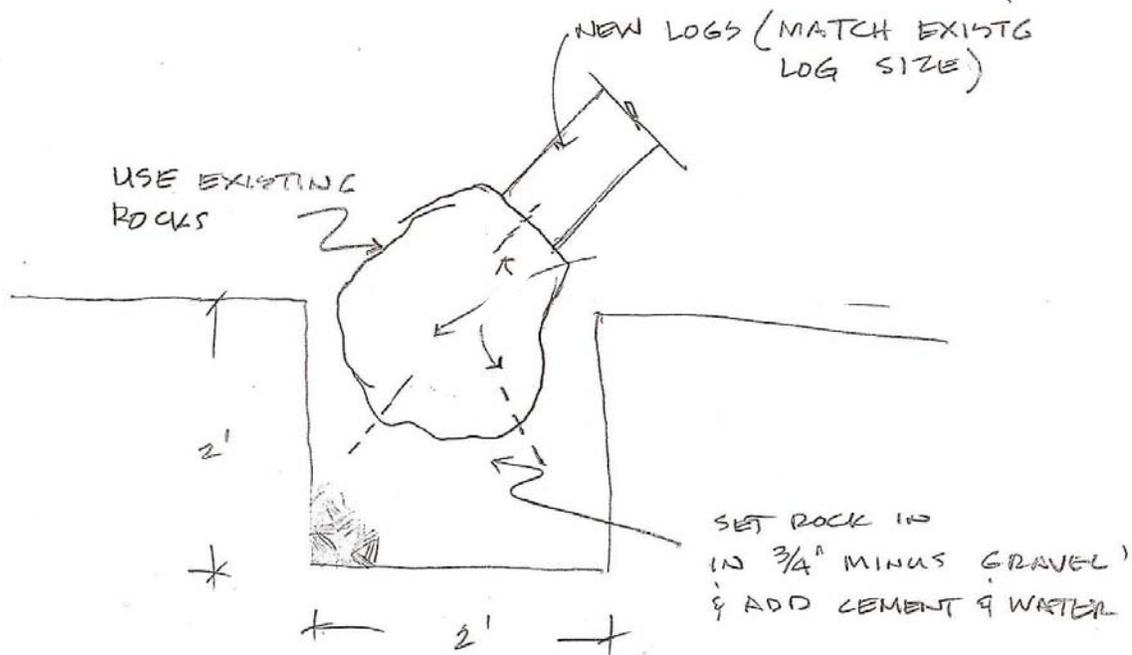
Drawing of proposed buttress/rafter boulder anchor restoration. Drawing by Wells Construction, Inc.
